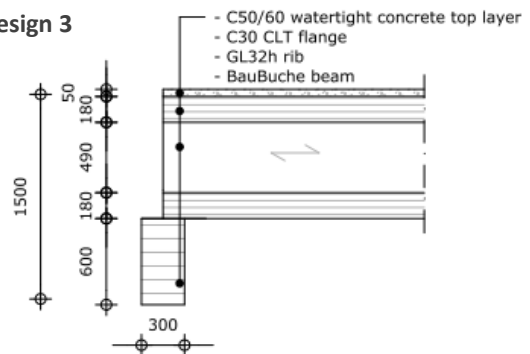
Floor design 3 BauBuche beam detail cross-section C-C maximum height in mm
